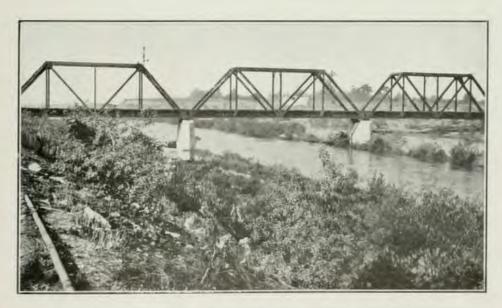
SALT LAKE BRIDGE ACROSS LOS ANGELES RIVER AT BUTTE STREET
